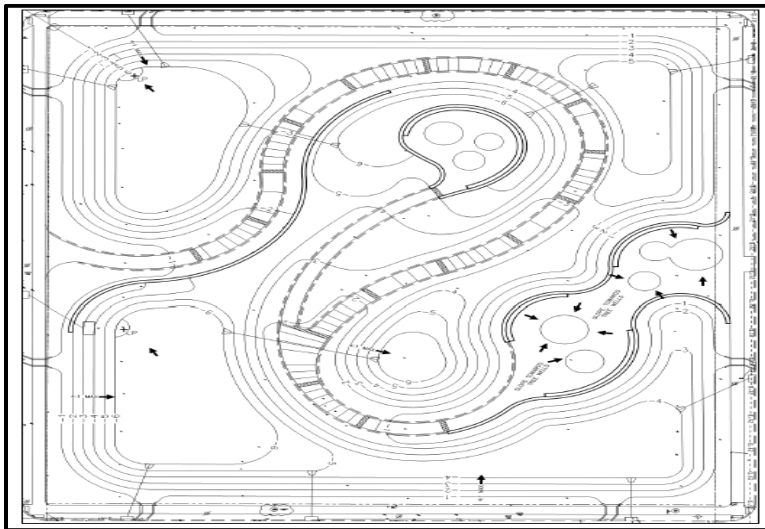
Saratoga Square Proposed Stormwater Park Grading Plan
